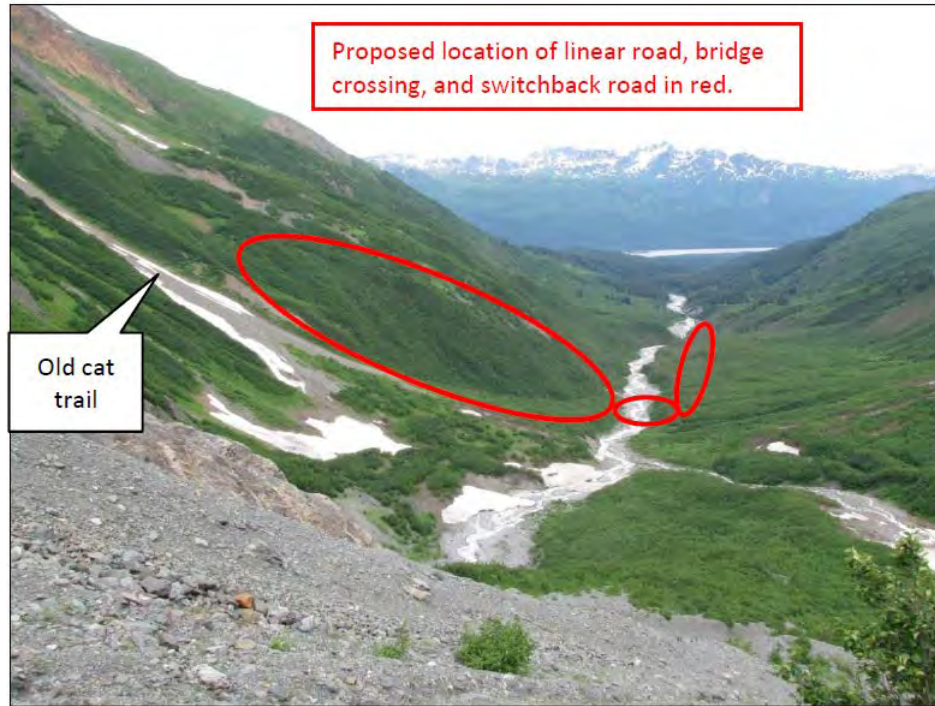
View looking East down Glacier Creek and proposed road alignment
